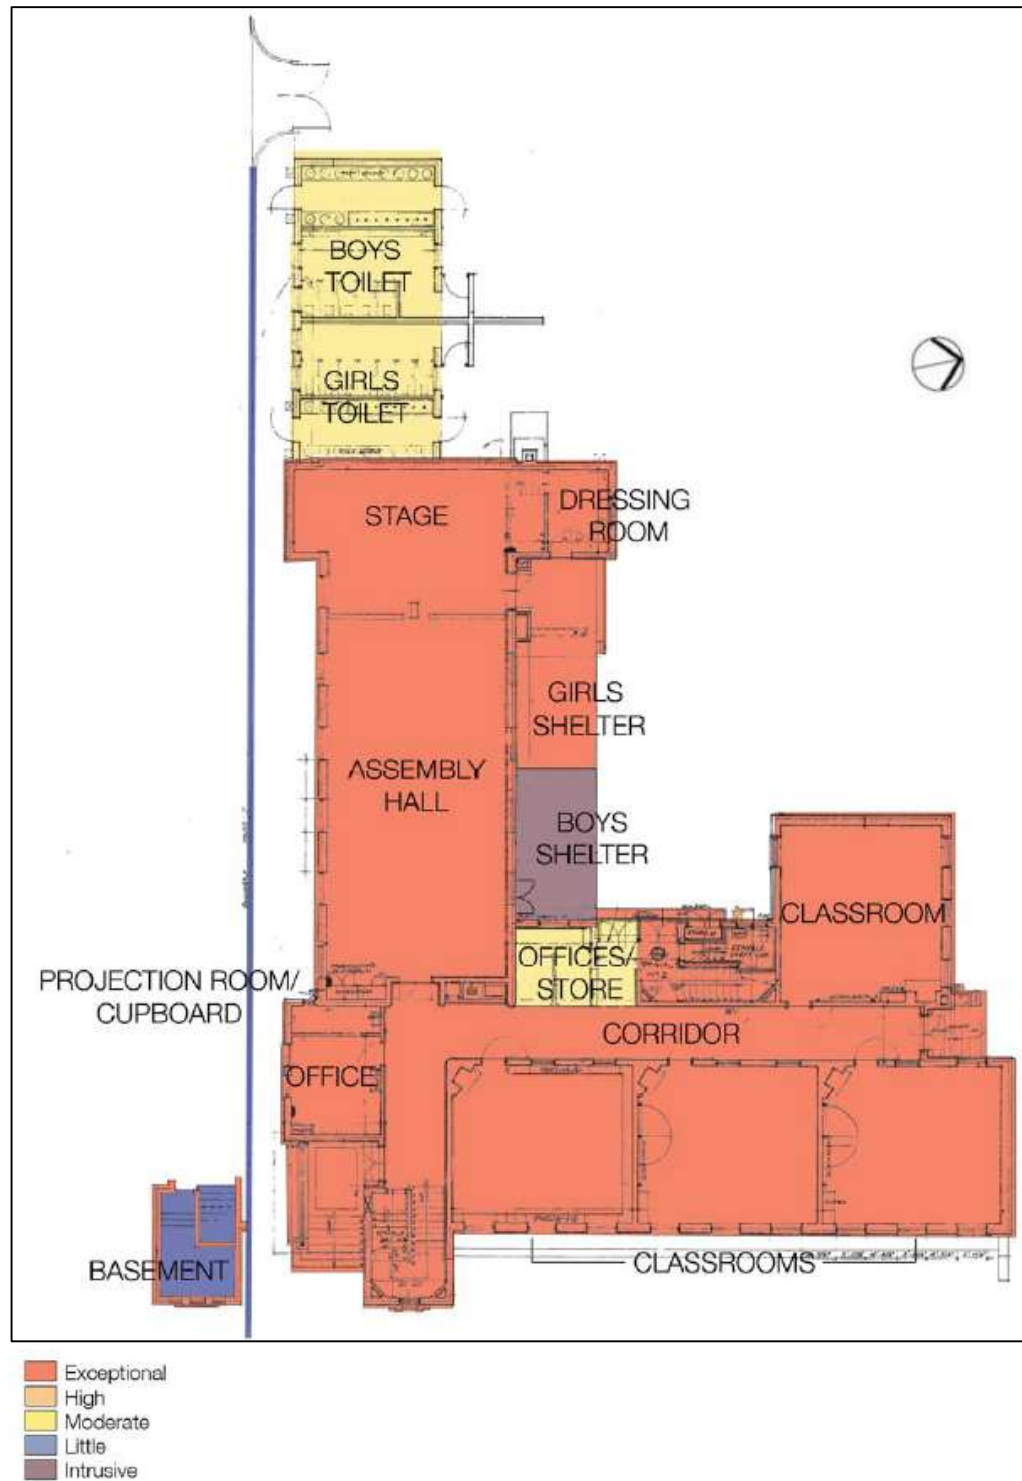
Significance of spaces in Fort Street Public School – Ground Floor (Source: TKD Architects 2016)
